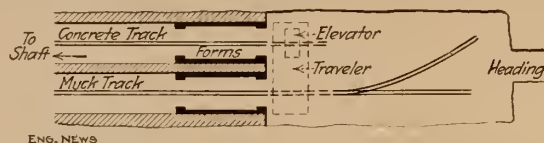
LAYOUT OF PLANT FOR PLACING CONCRETE IN DOUBLE-TRACK TUNNELS, LEXINGTON AVE.
